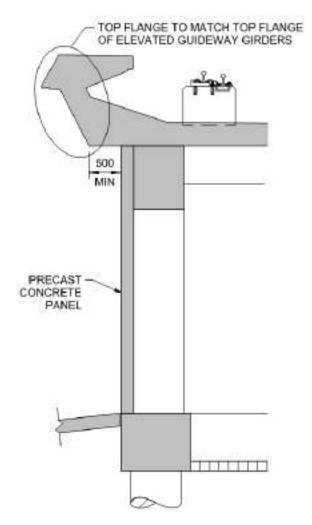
E: 87 Avenue Elevated Guideway Ramp Partial Section - Trough Girder
